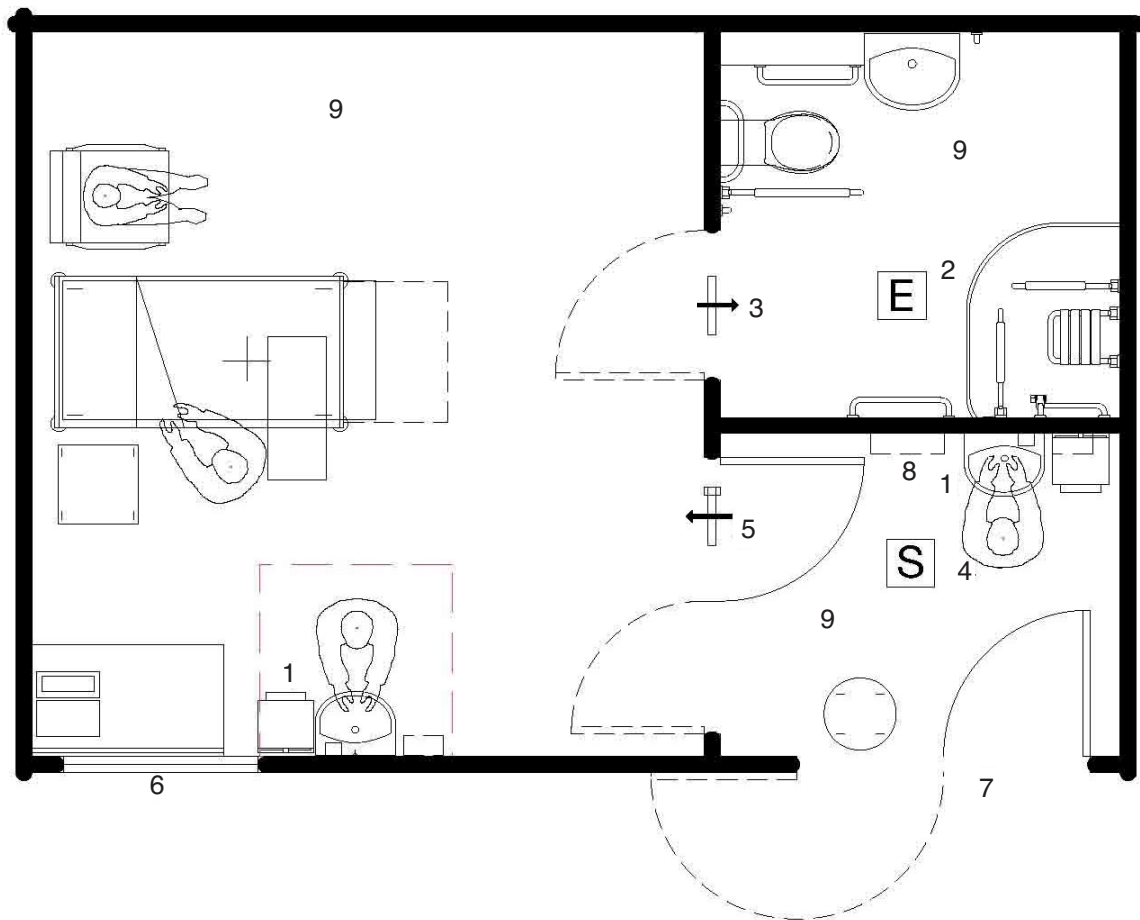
New build single room with en-suite facilities and lobby (PPVL)
